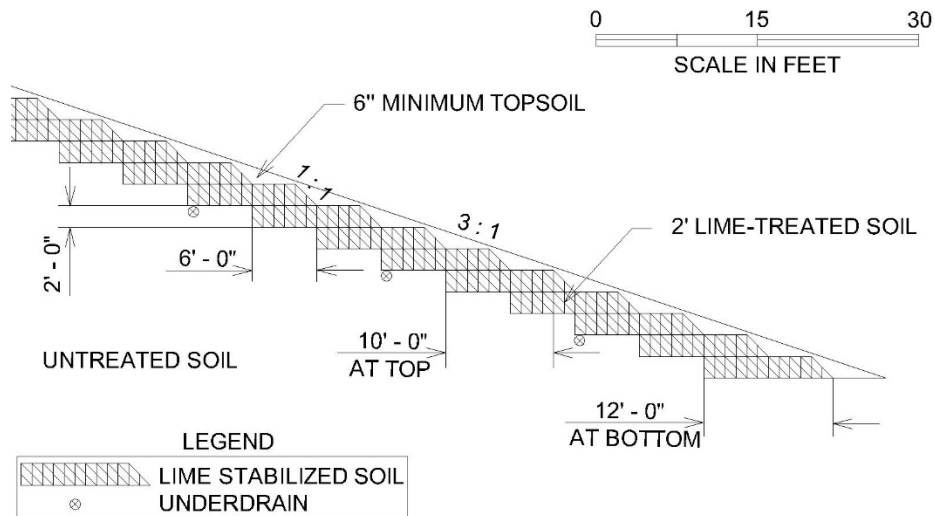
Plan details of lime-treated slope section of the U.S. 75 Frontage Road
